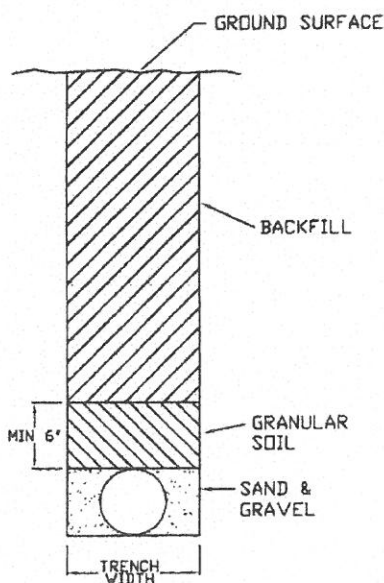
Tubing Encased in Sand and Gravel Envelope for Support.
